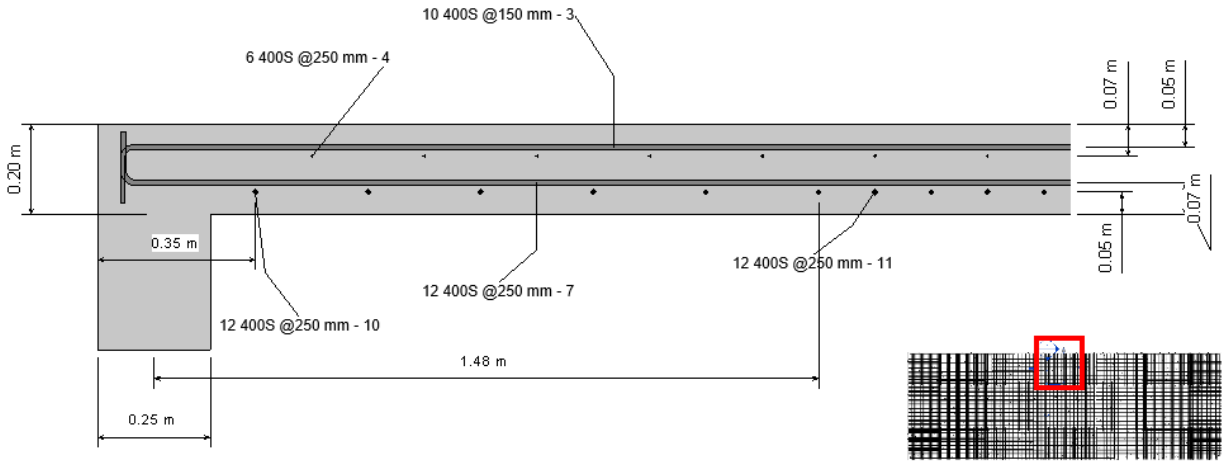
Section View detail of the fixed edge strip of panel B
